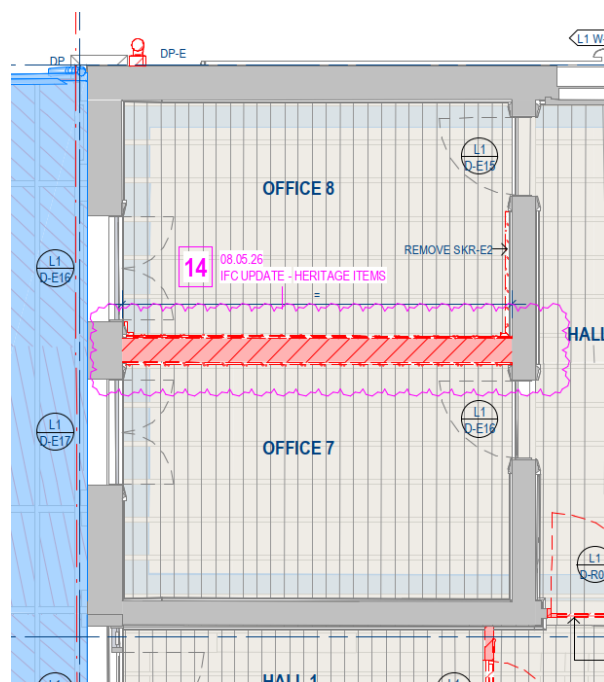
Extract from Amended Plan AR 15.03 - Level 1 – Existing/Demolition
